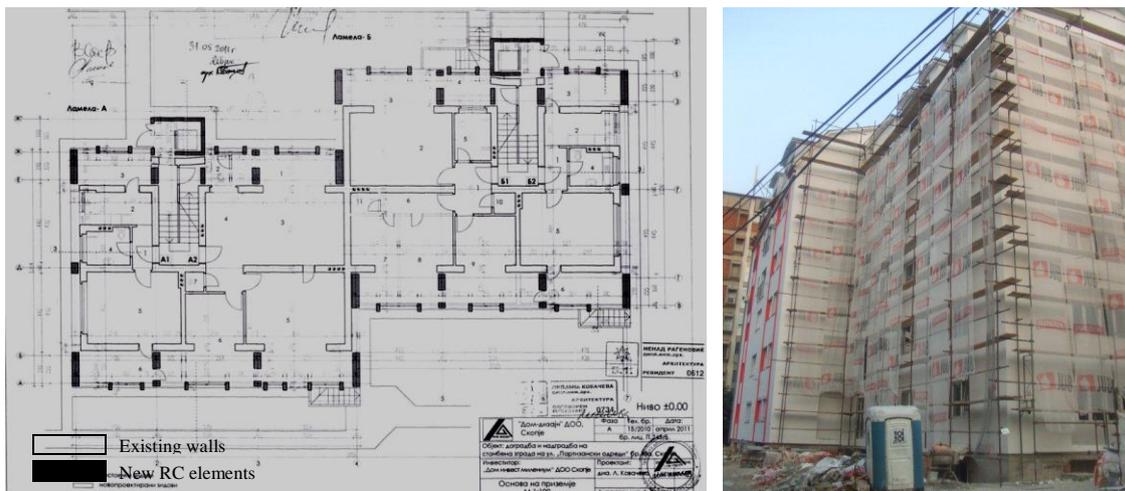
Ground floor plan of the existing structure with new RC part and photo during the construction
